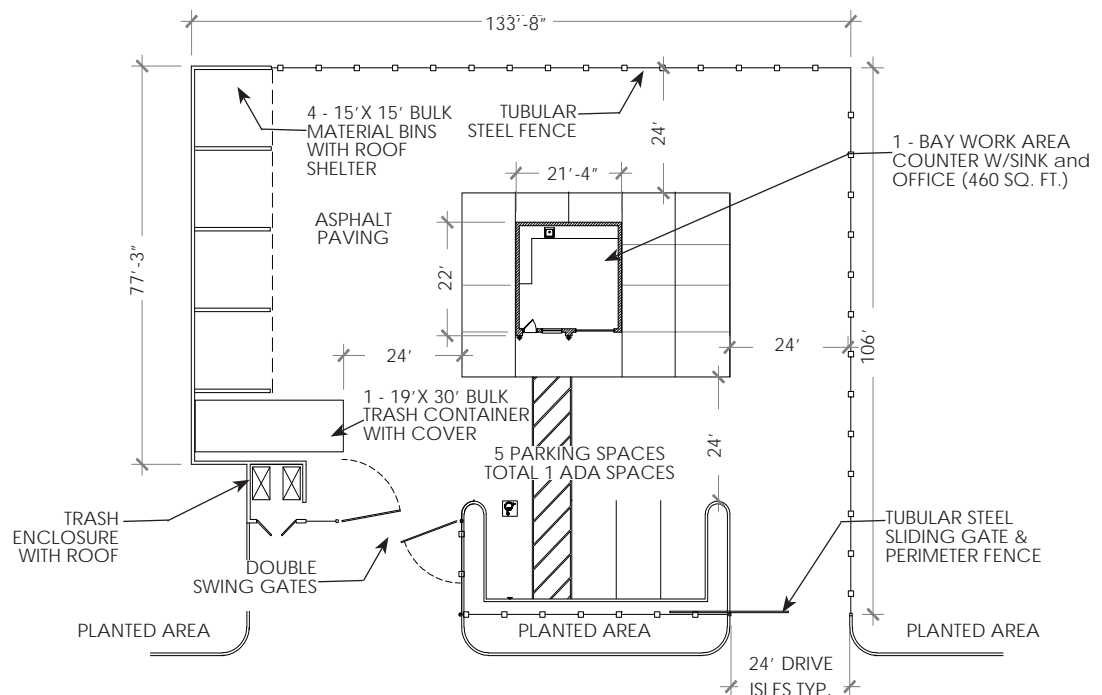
Preferred Small Maintenance Building and Yards Layout Diagram -
